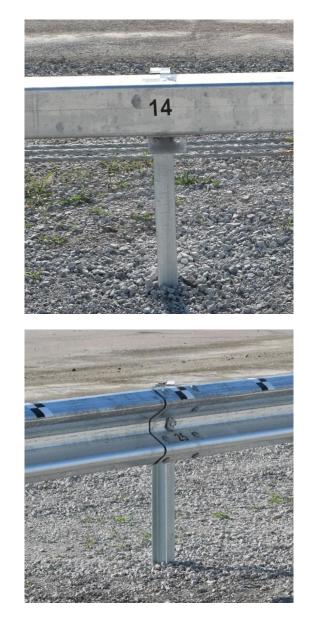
Box Beam and W-Beam Rails, Test No. NYBWT-2
